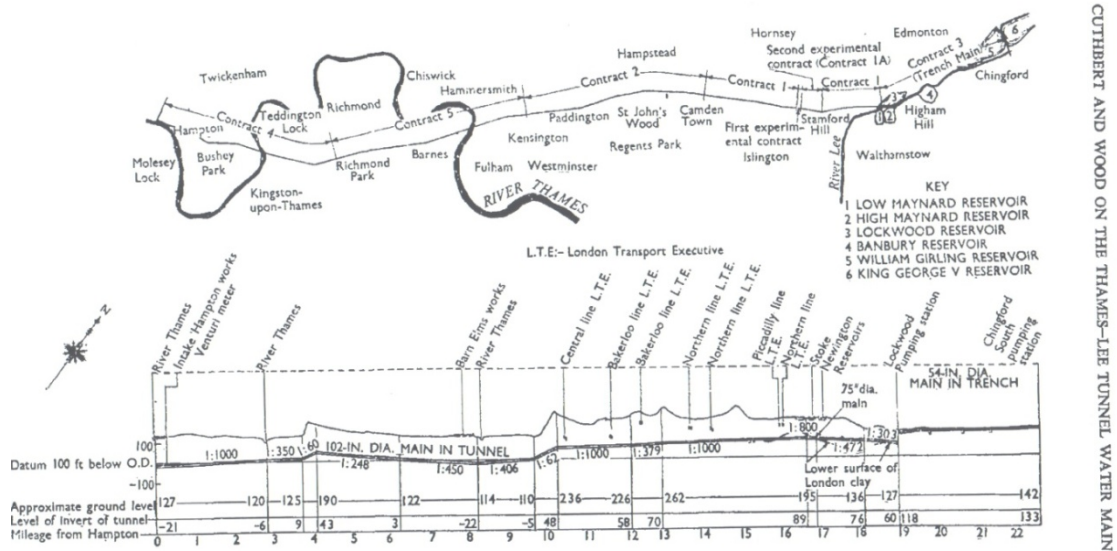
(above)—PLAN OF THAMES-LEE TUNNEL MAIN (below) LONGITUDINAL SECTION
